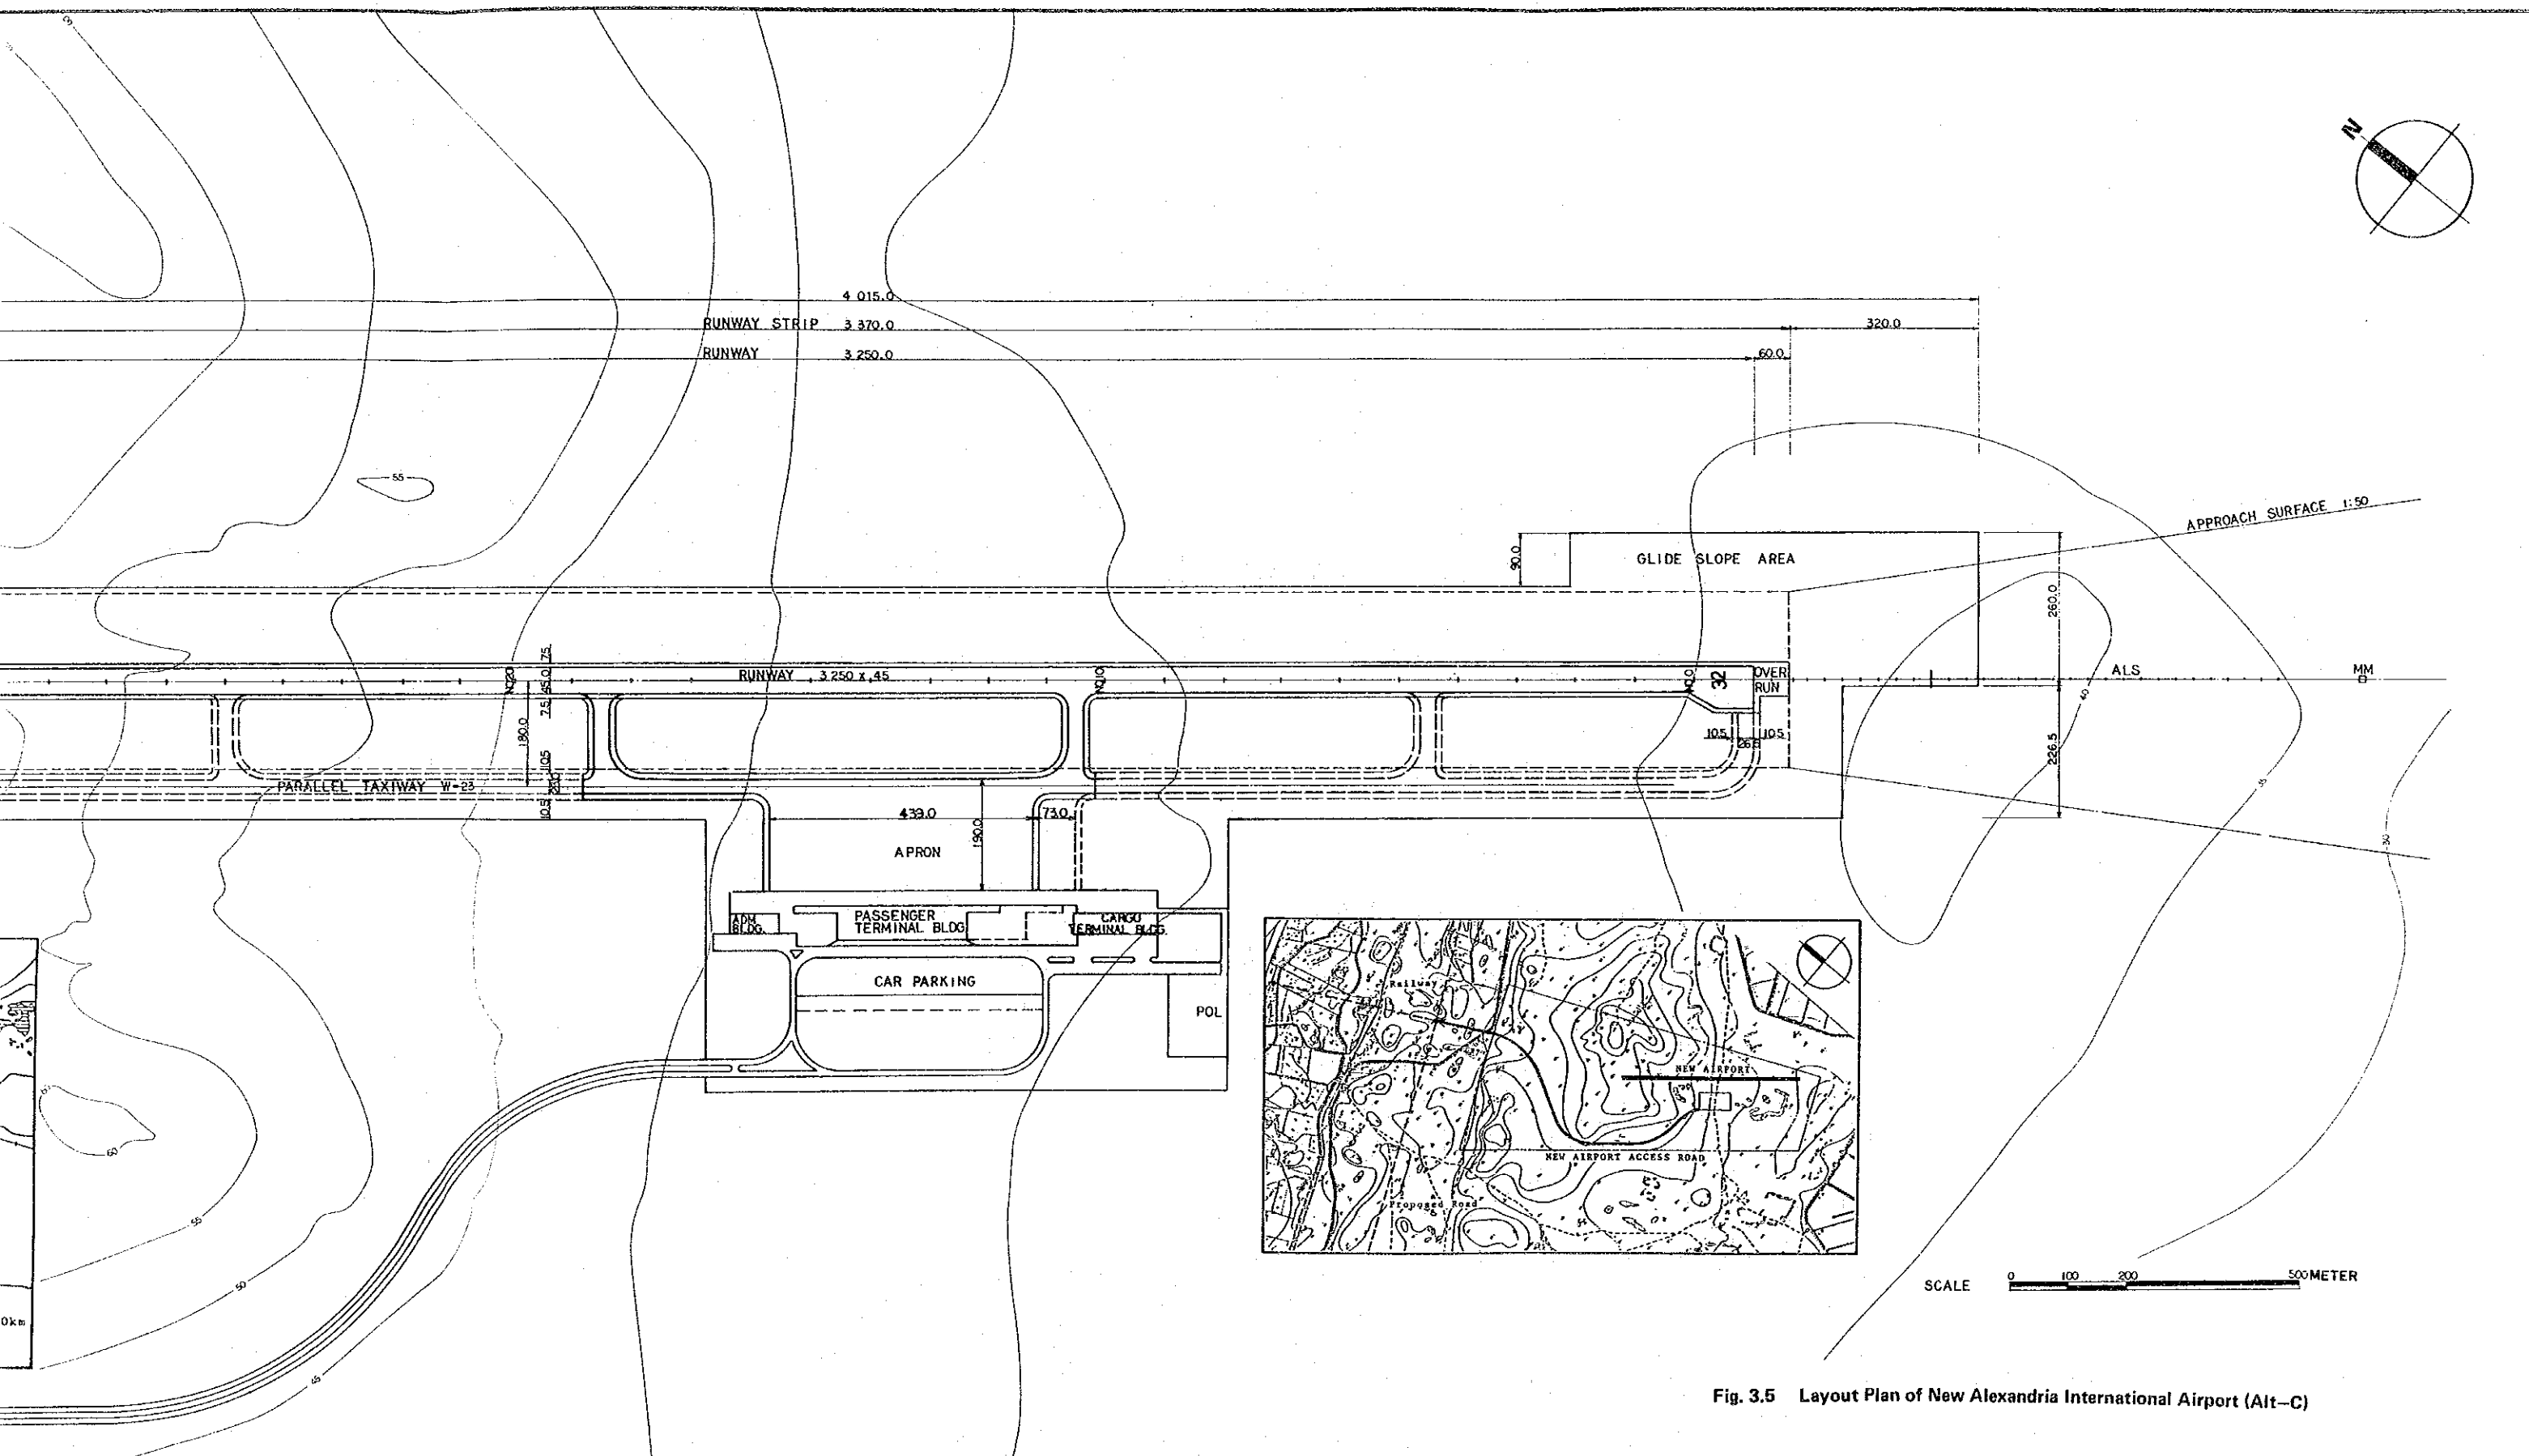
Layout Plan of New Alexandria International Airport (Alt-C)
